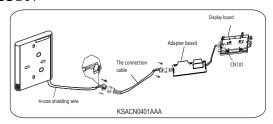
Installation of KSACN0401AAA for High Wall Indoor Models
